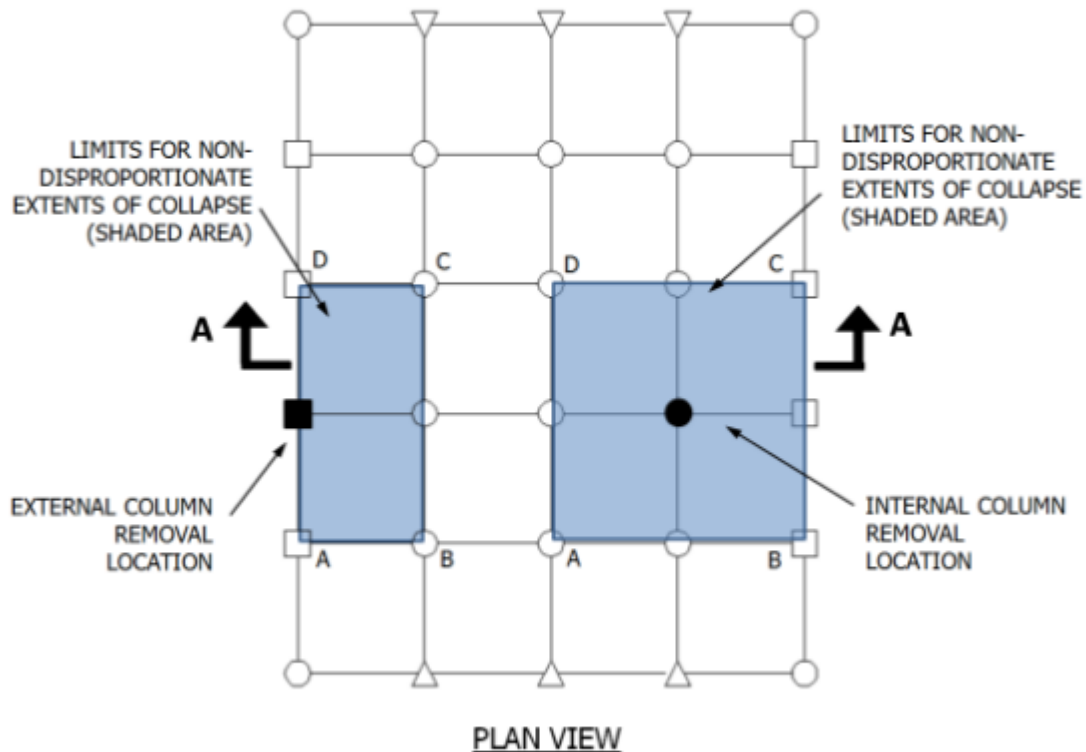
Allowable Extents of Collapse for Interior and Exterior Column Removal in Plan
